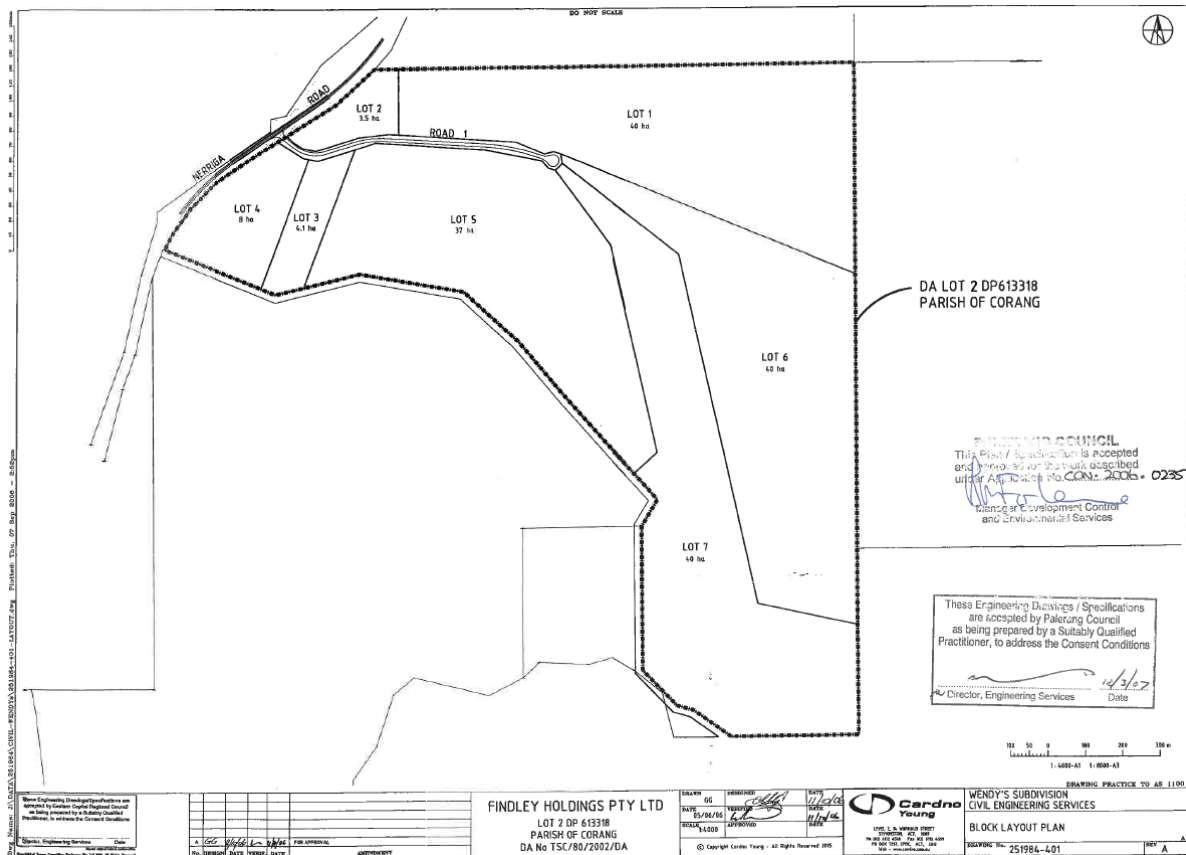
Approved Subdivision Plan (TSC/80/2002/DA)
